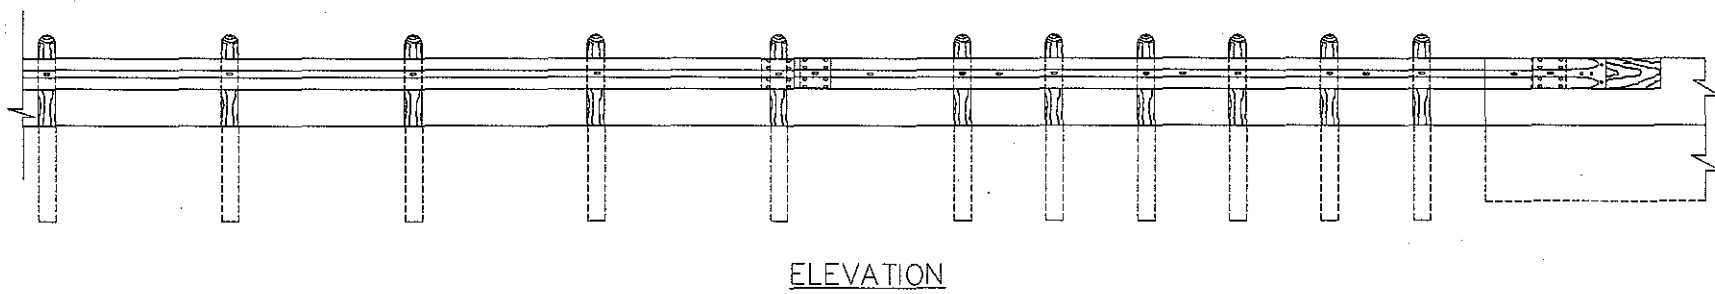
GUARDRAIL TO BRIDGERAIL TRANSITION USED IN TEST PROGRAM
